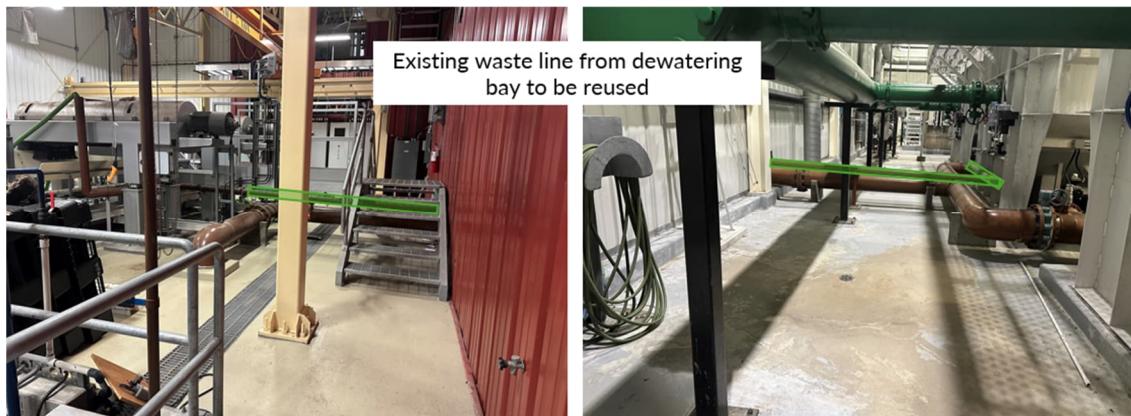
Existing waste line in dewatering building to be reused for MIEX waste
